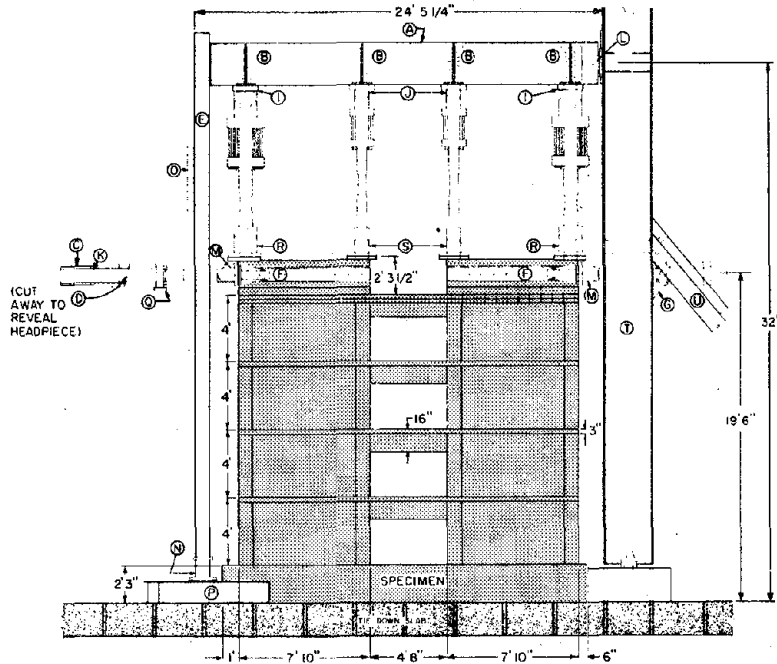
FRONT VIEW OF THE SPECIMEN AND THE TEST FRAME
